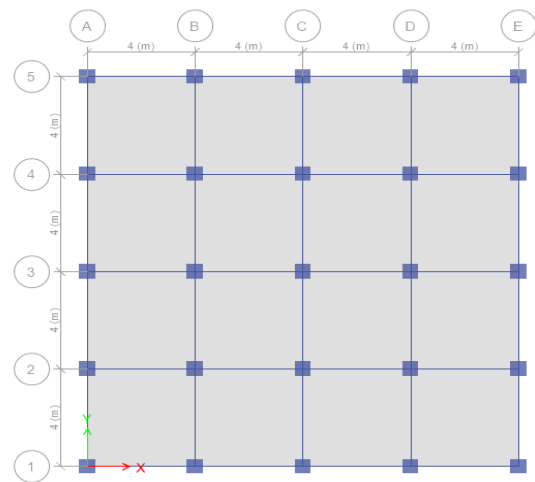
Plan of regular structure R1 representing bare frame and frame with bracings and infill walls
